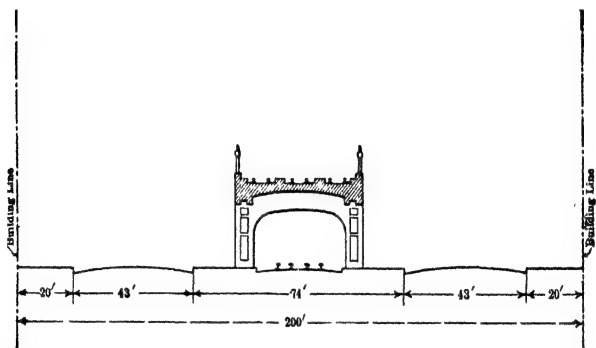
Cross-section of Queens Boulevard, New York, with three-track elevated railroad on reinforced concrete structure and surface tracks beneath.
